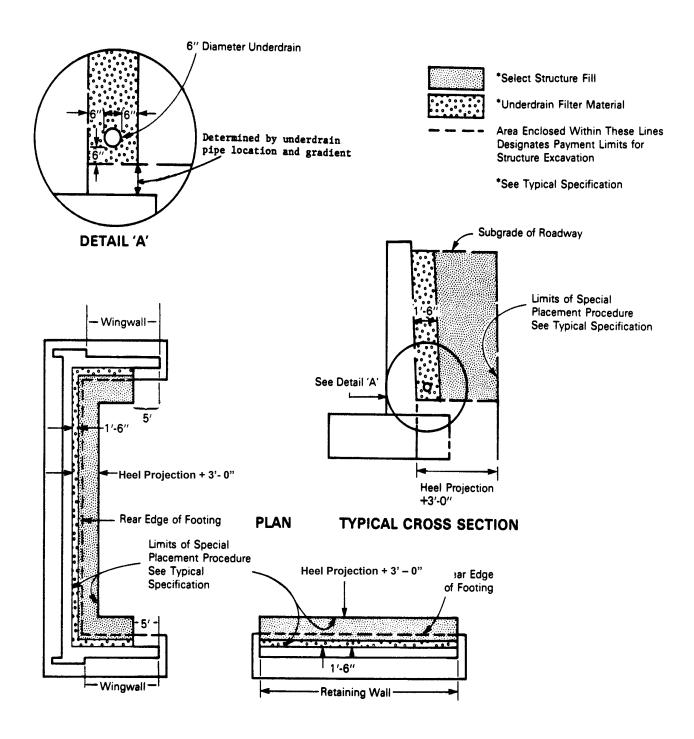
Structure backfill placement limits for porous drainage aggregate.
